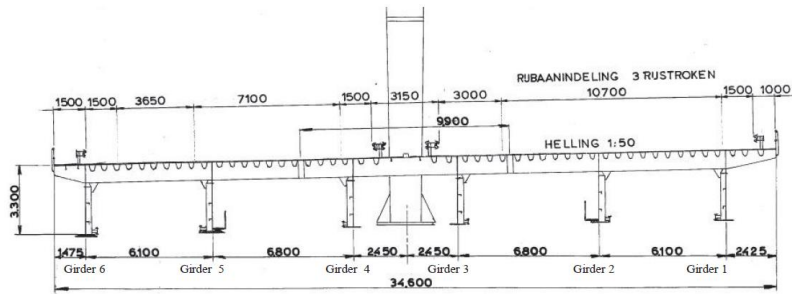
Cross section orthotropic steel deck of the Galecopperbrug (ARUP, 2009).
